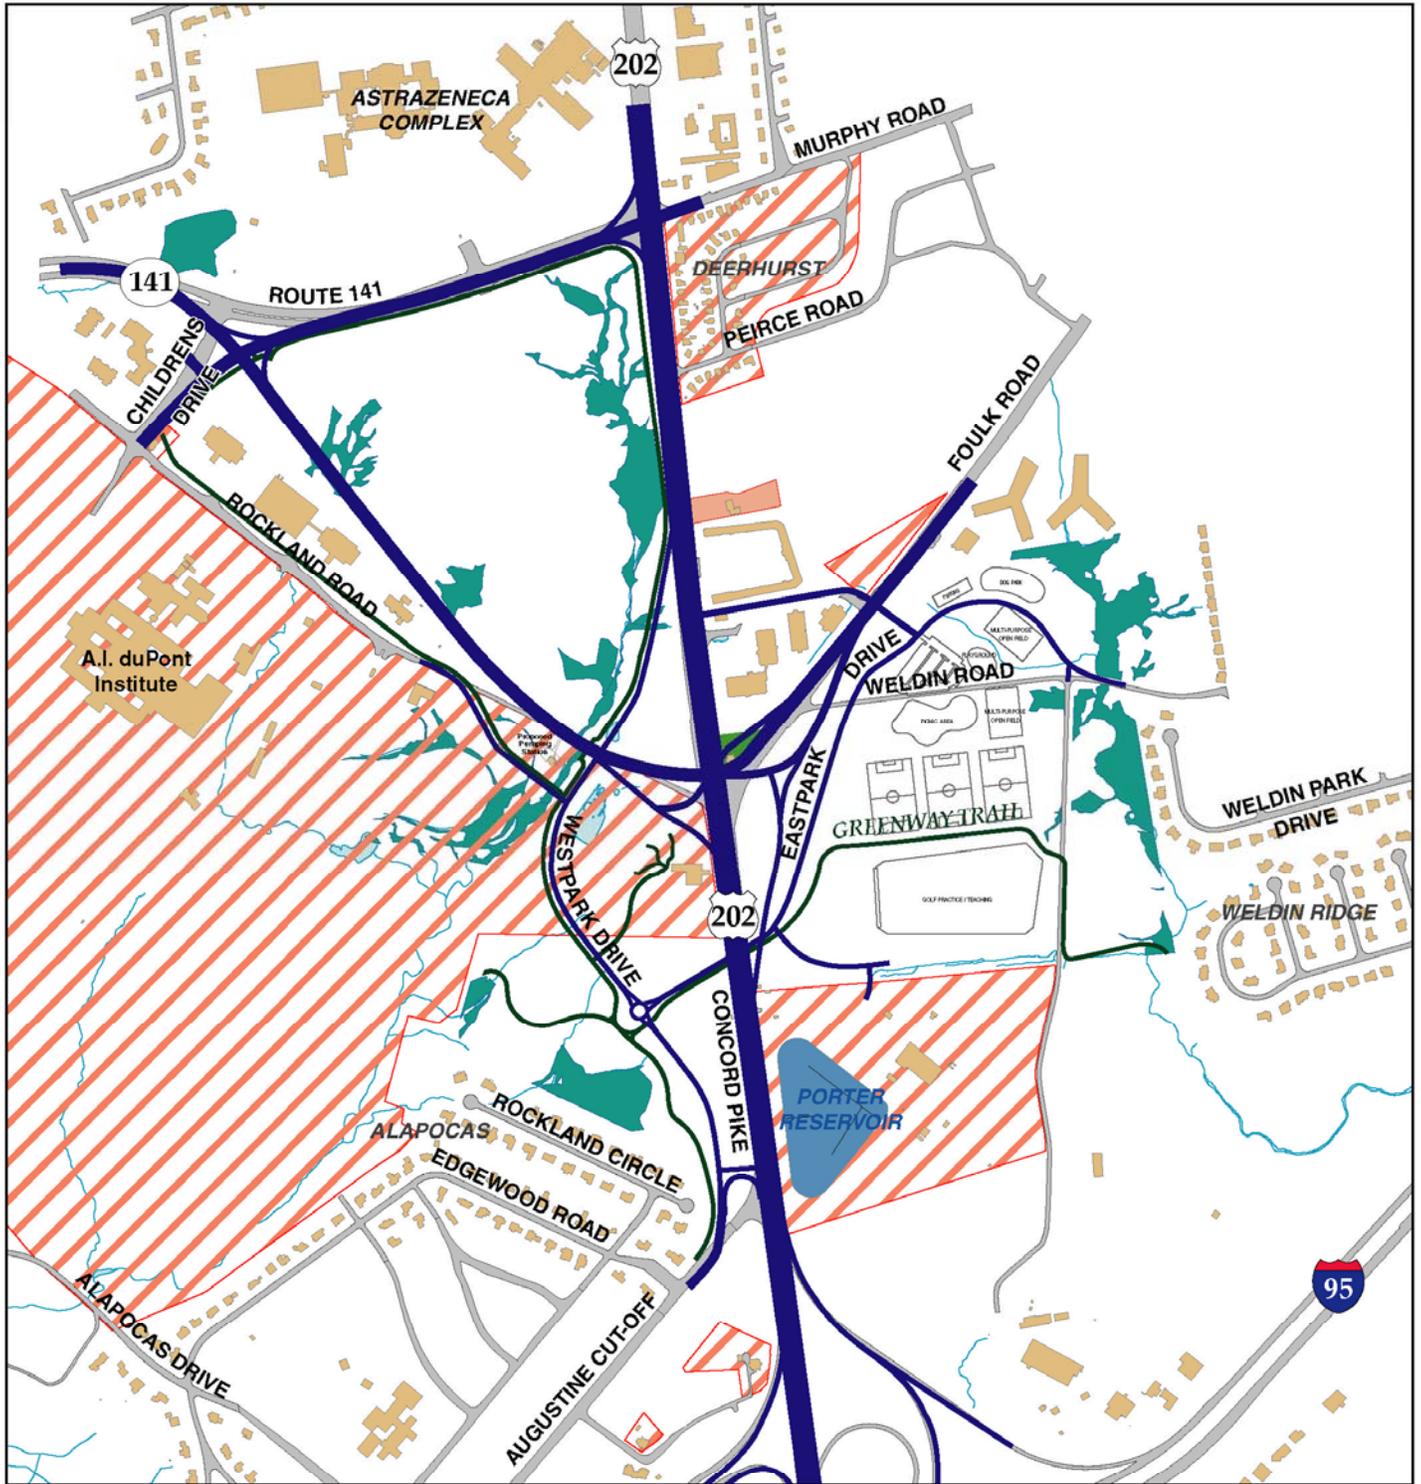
MASTER PLAN ALTERNATIVE - MODIFIED (WITH WELDIN OPTION A)
